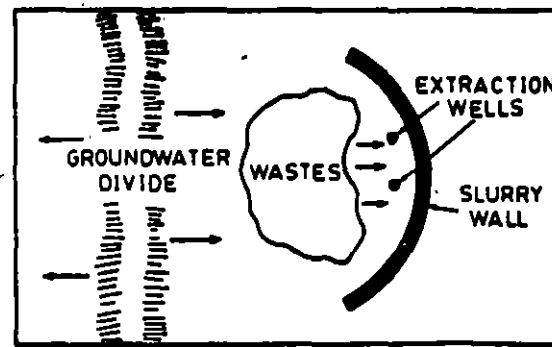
Slurry wall and extraction wells used to collect leachate.
